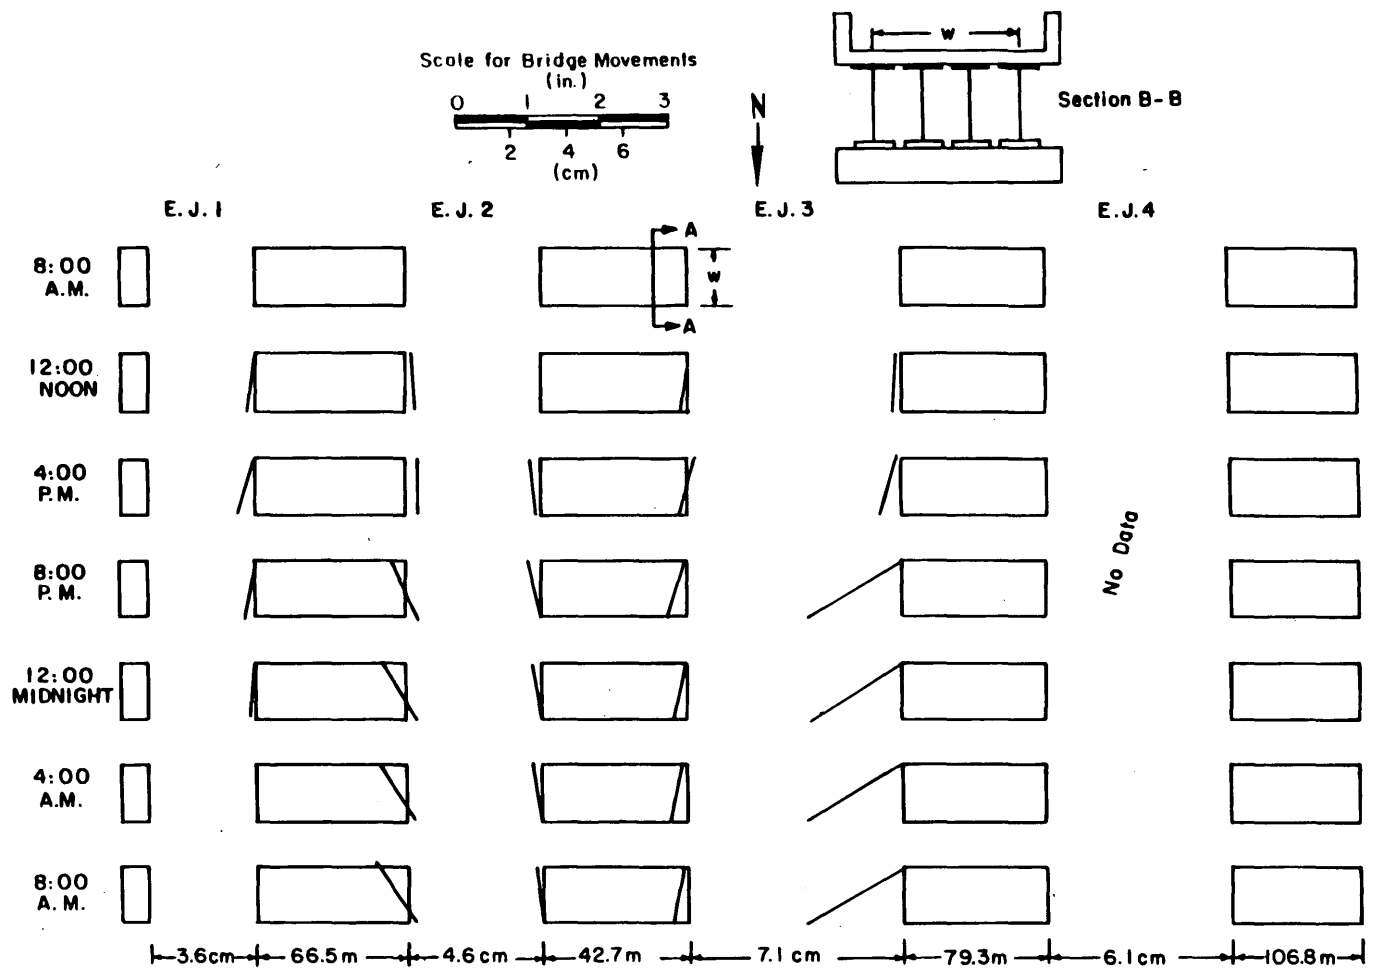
Plan view of bridge showing 24-hr movements of deck units with respect to cap for October 22, 1987. (Note: Longitudinal dimensions of girders and joints are not to scale, but actual joint displacements are to scale as shown.)
